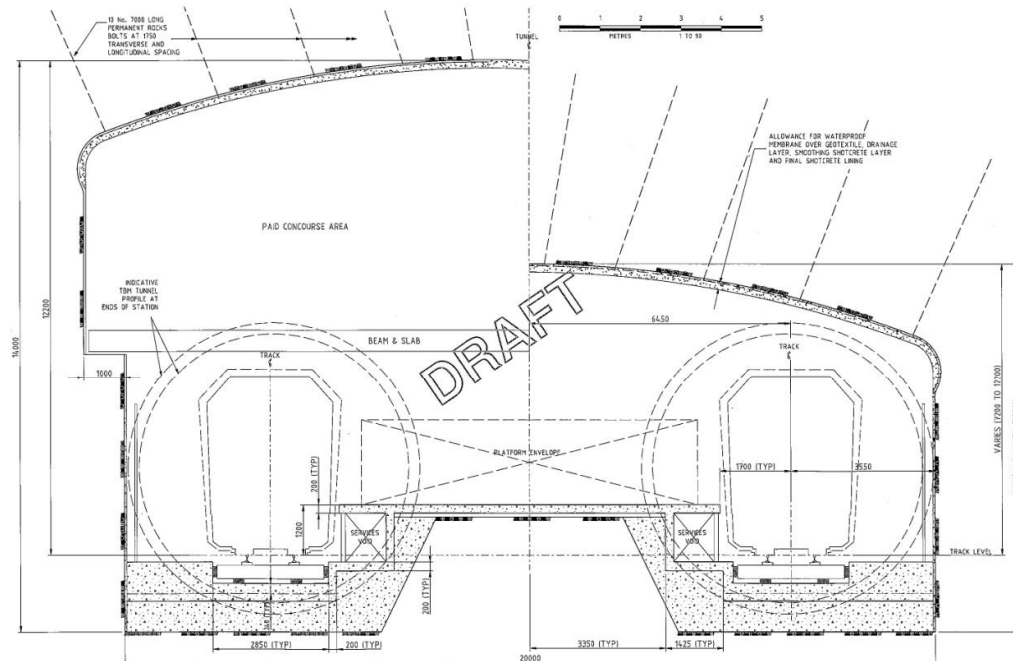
Proposed CBDRL Mount Street Station cross section (per Halcrow drwg TTSRCP-602, Vers 3)
